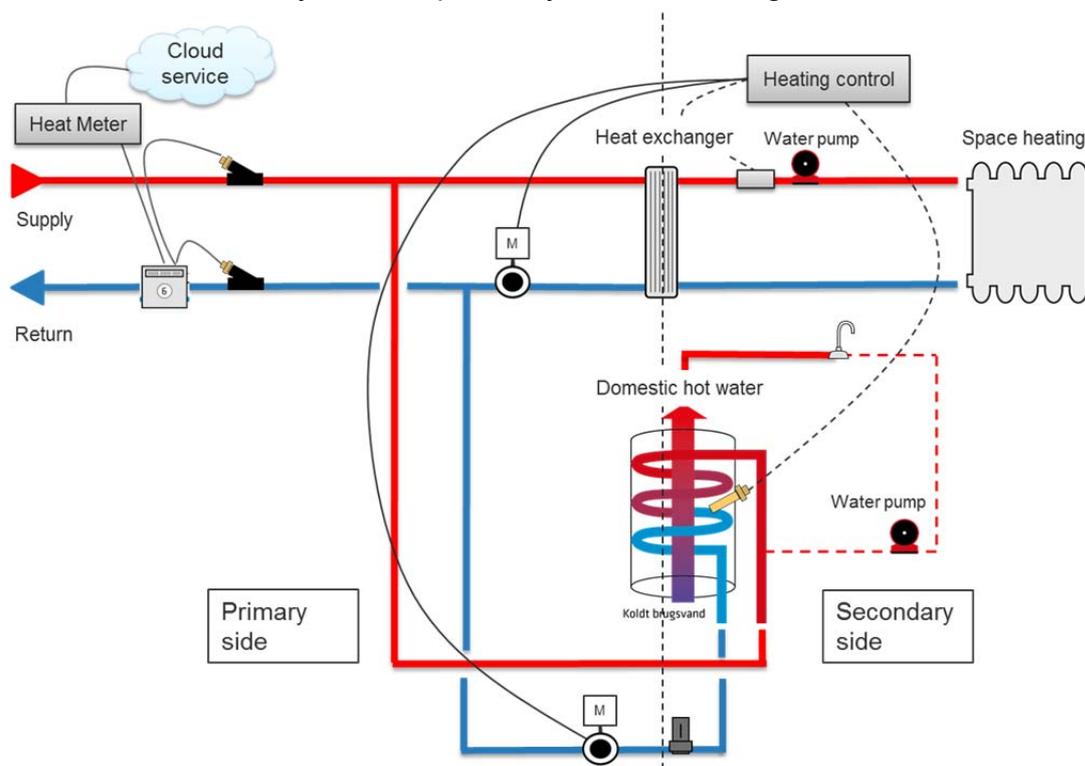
Typical district heating substation with a central heating-, and a domestic hot water system
